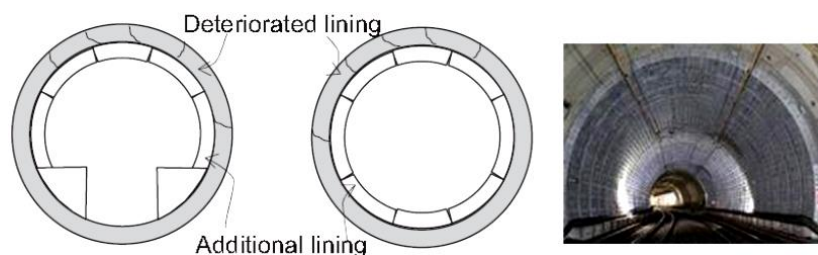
Additional lining support installation on the tunnel lining [12].
